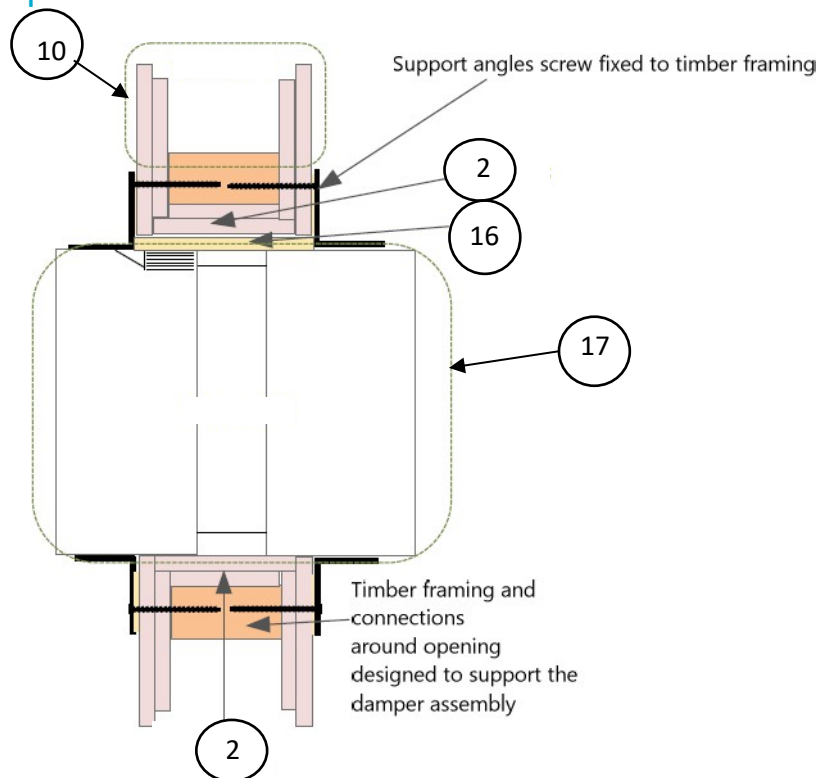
Typical damper installation detail for timber-framed wall – Section view
